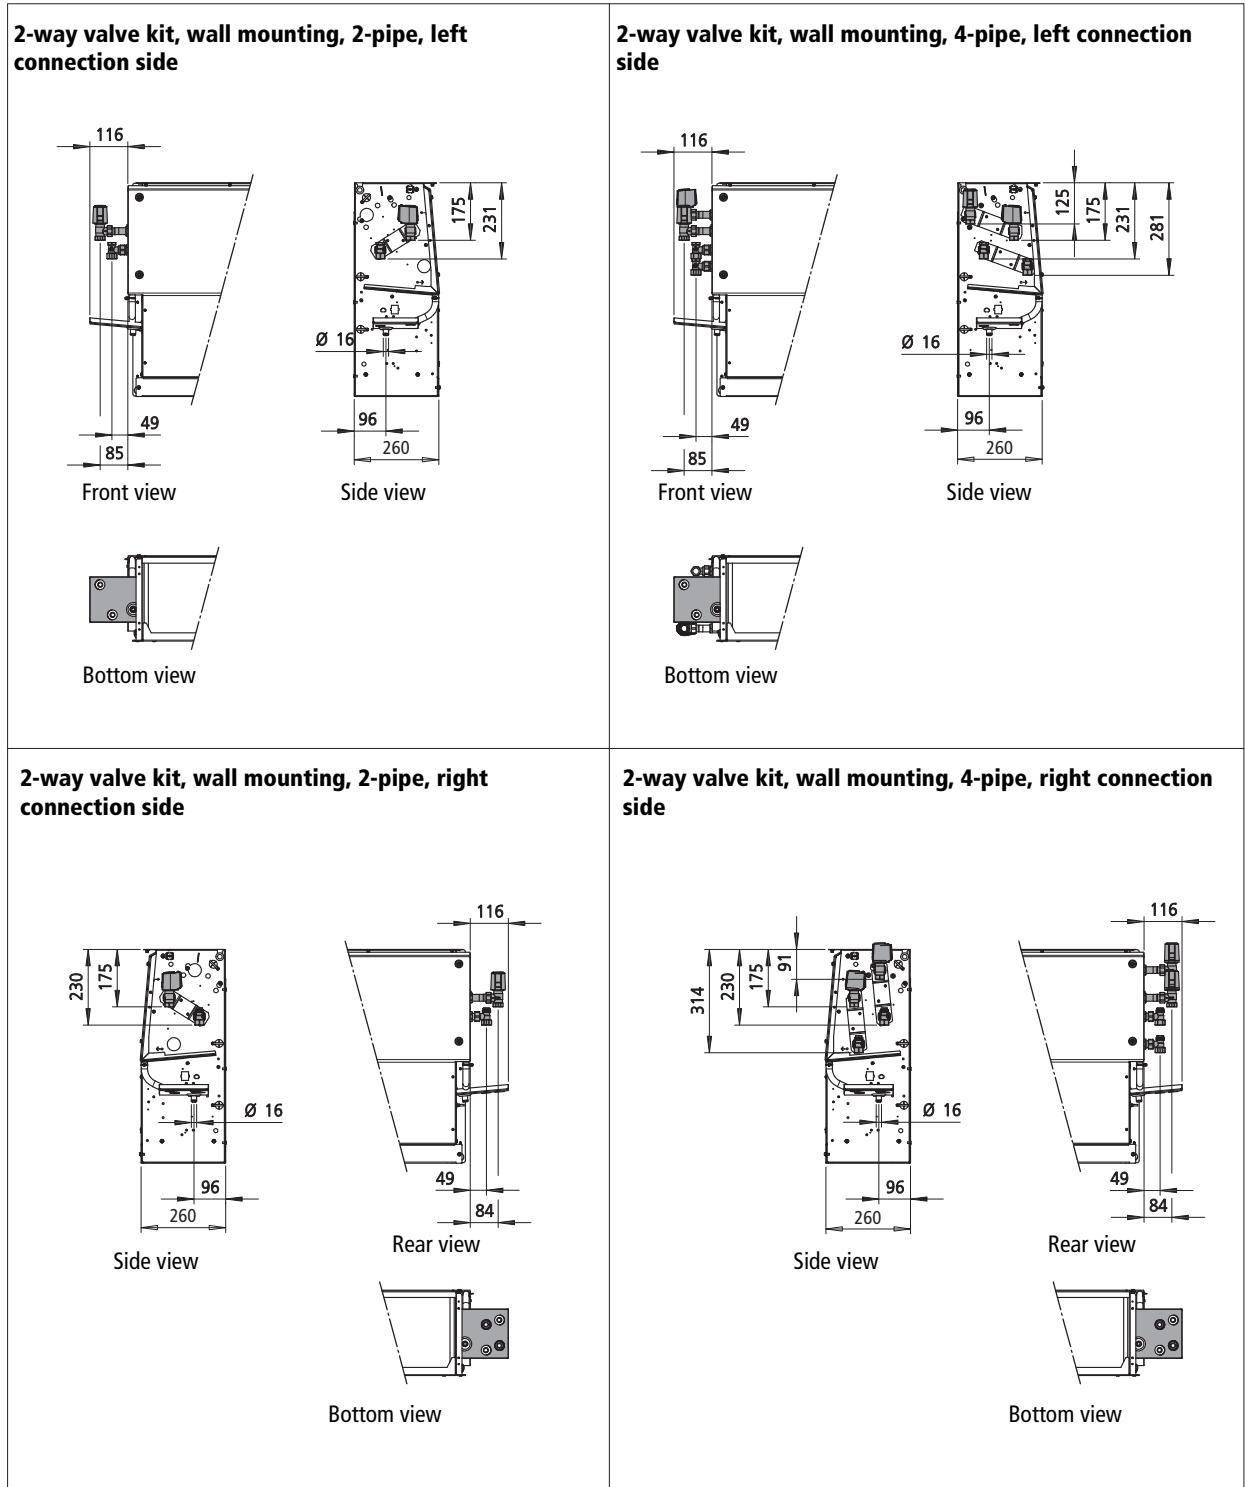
Dimensions 2-way valve kit (wall-mounted version)
